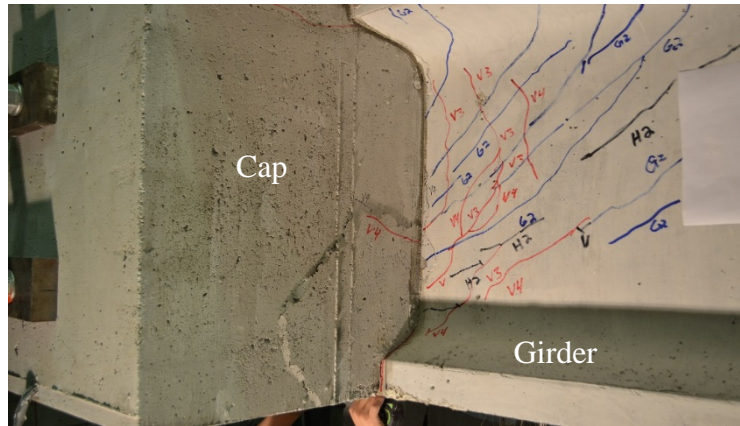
Cracking of cap cover concrete adjacent to girder
